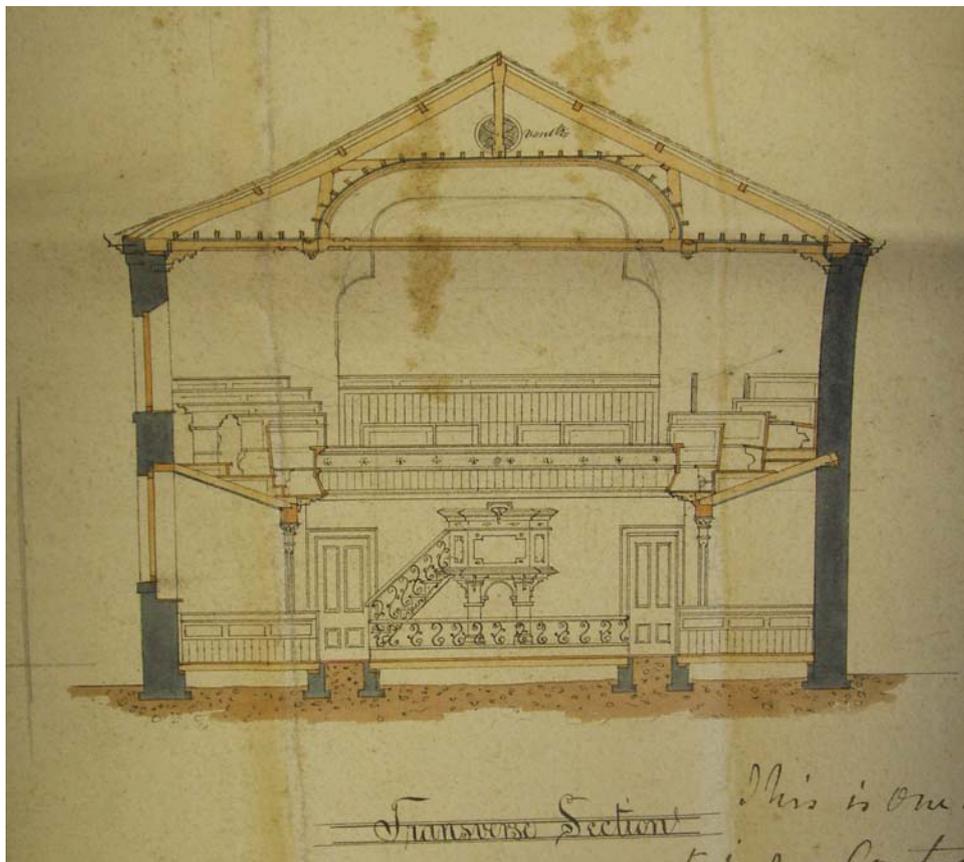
Cross-section as proposed in original drawings of 1872 (CRO(B) Z1099 1872)
